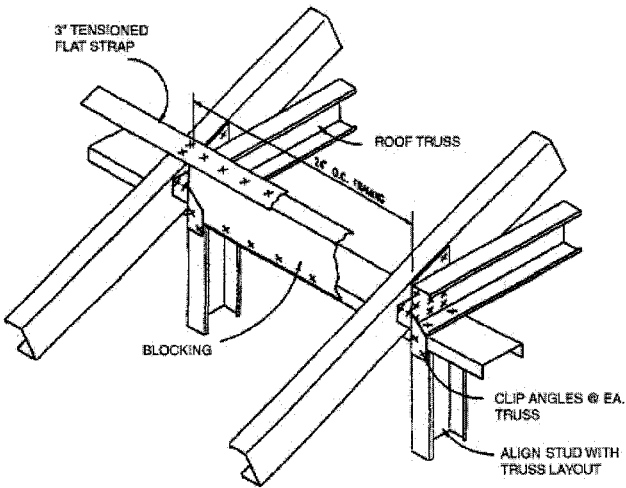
Typical Shear Blocking Detail (LGSEA 2003)
